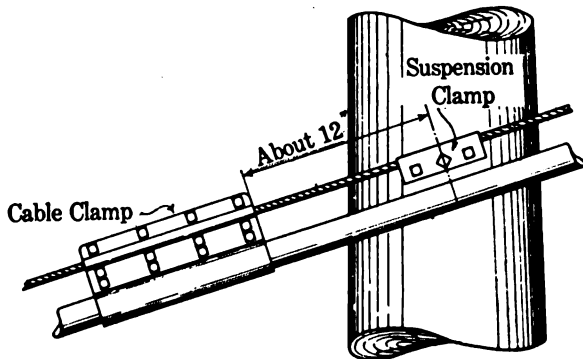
CLAMPING CABLE TO MESSENGER ON STEEP GRADES
